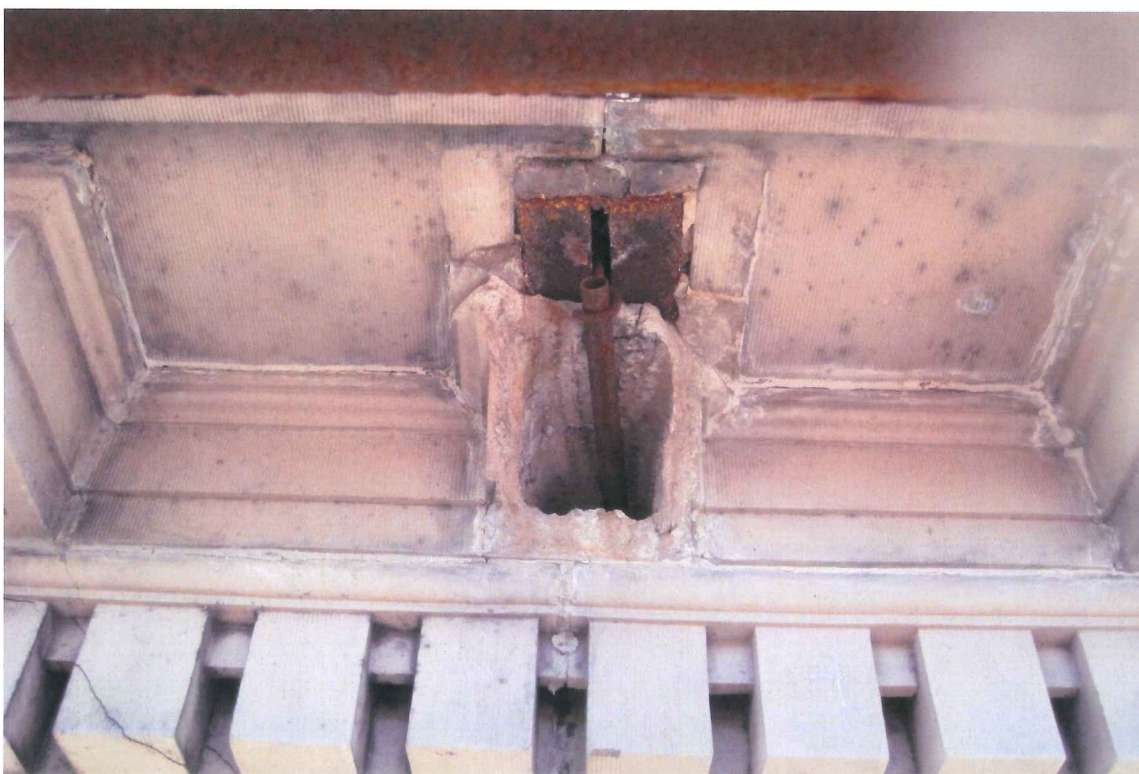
Detail of steel armature after removal of broken block modillion. Note cracked dentils below. Structures North, Dec 2009.
